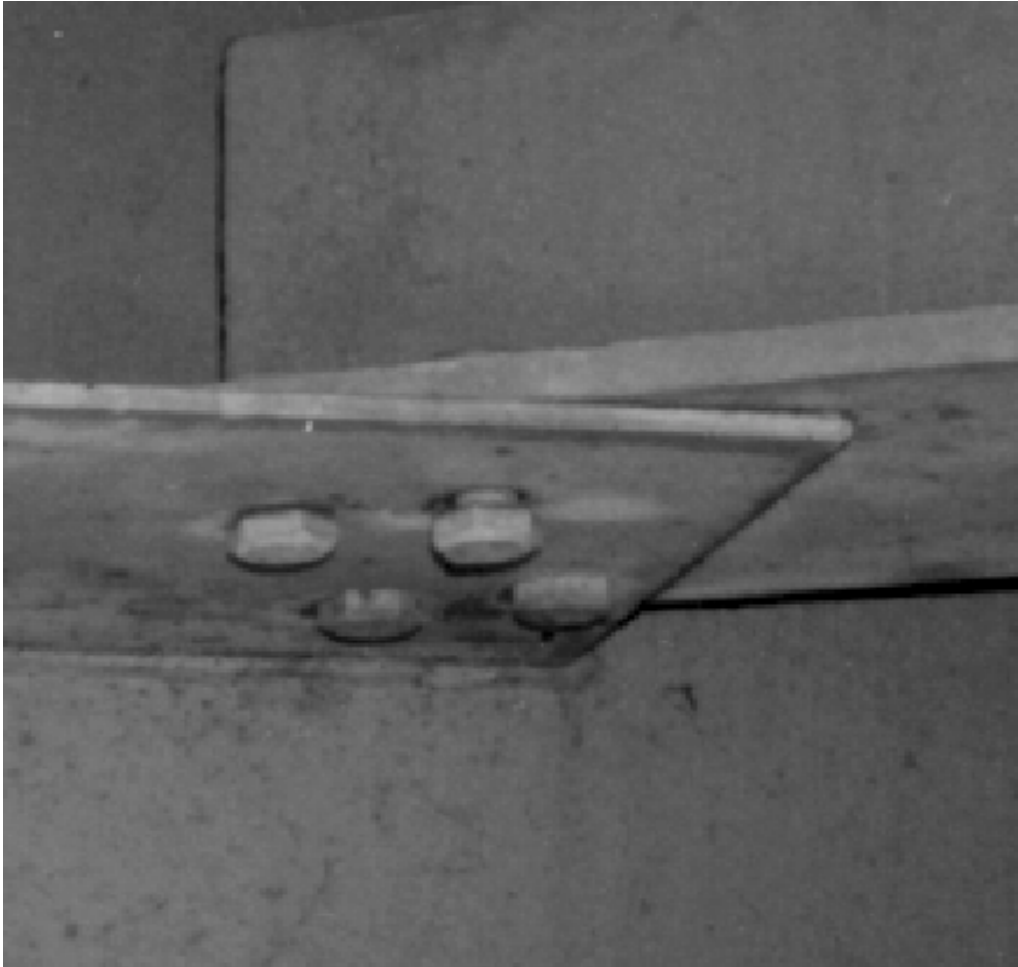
View of loose bolt at lateral brace to gusset plate connection
